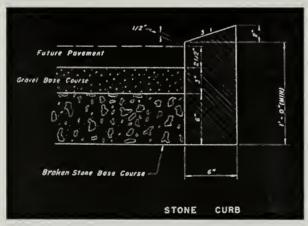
Granite curb with sloped face, from Paradise Hill Road. (U.S. Department of Commerce, Bureau of Public Roads, Project 6A5, Sheet 7 of 24, July 1952)
